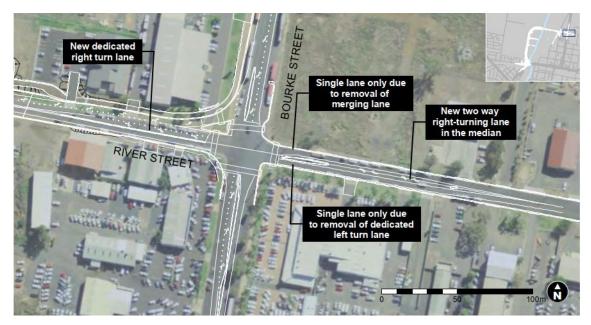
Modified layout schematic for River Street/Bourke Street
